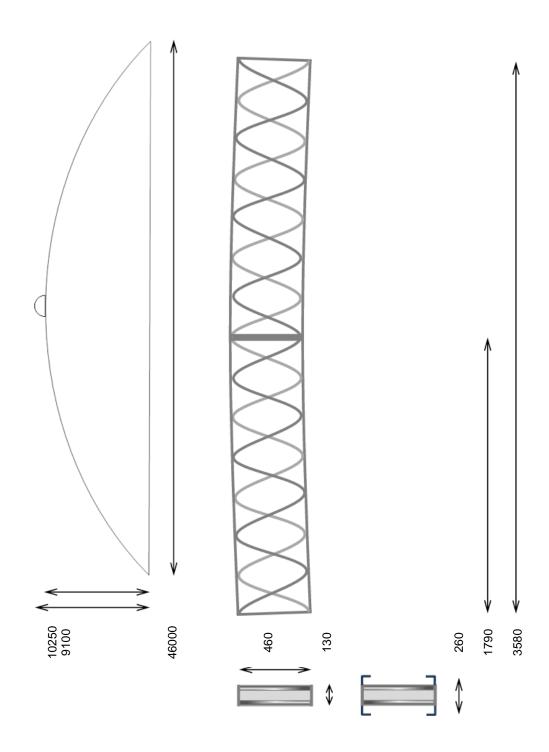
Drawings and dimensions (mm) of truss elements and overall building dimensions
